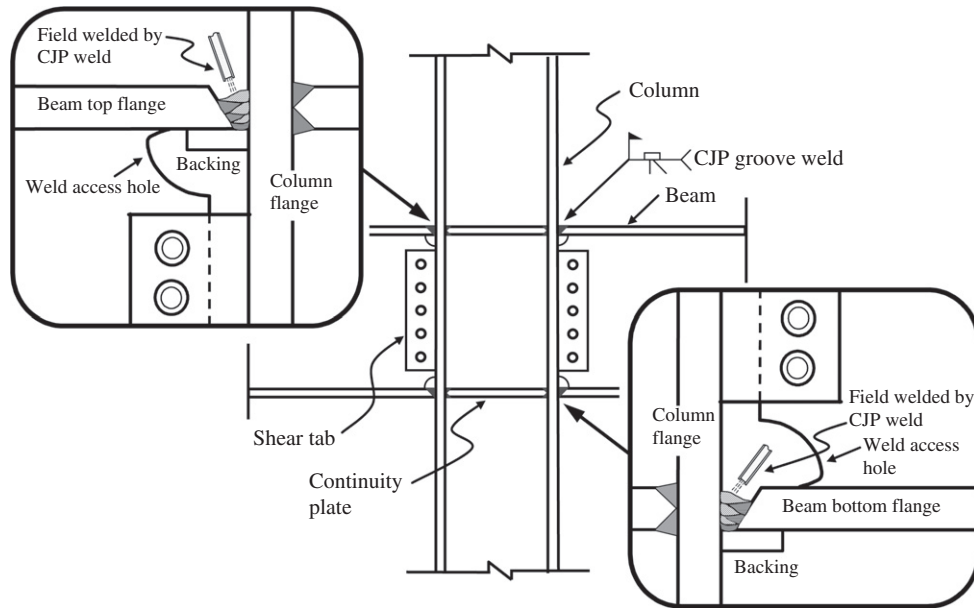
Typical connection details of web-bolted flange-welded pre-Northridge moment connection.
